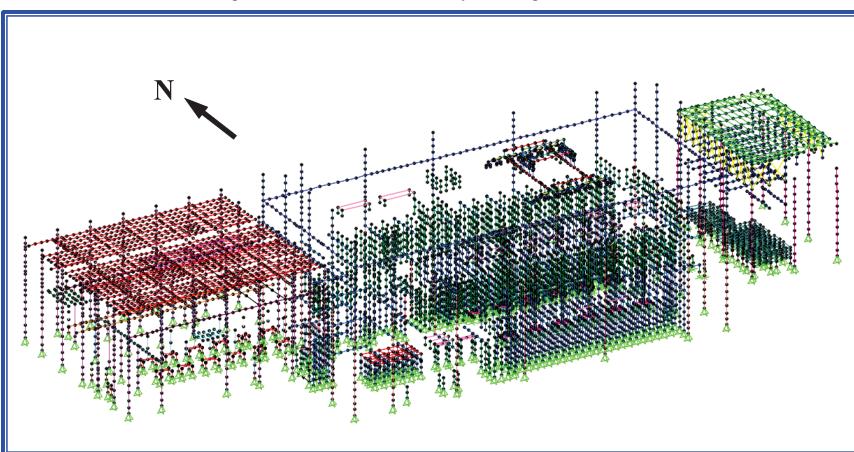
Beam Elements of Triple Building SAP2000 Model
